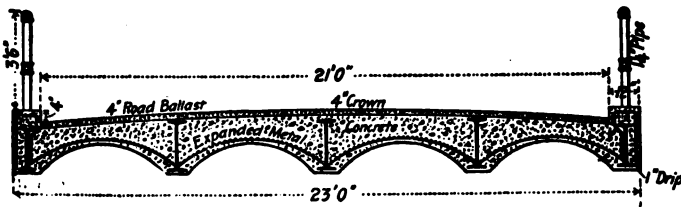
Concrete and Steel Beam Highway Bridge.
